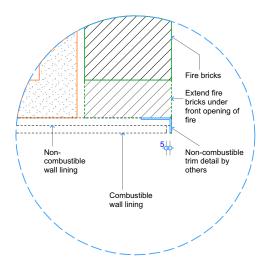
Plan View Fire Surround Opt. 1 Timber Cavity
